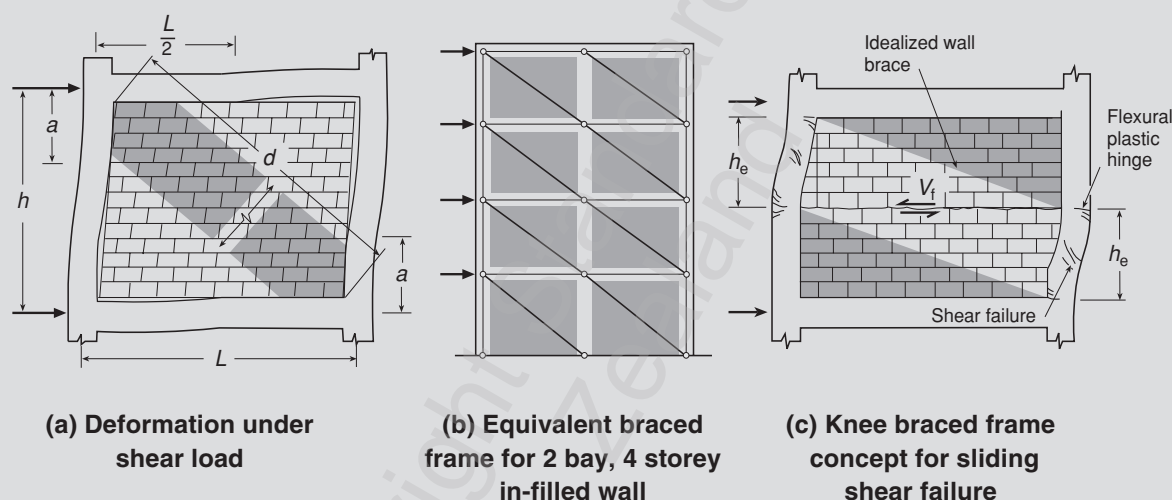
Equivalent diagonal bracing action of masonry in-fill
